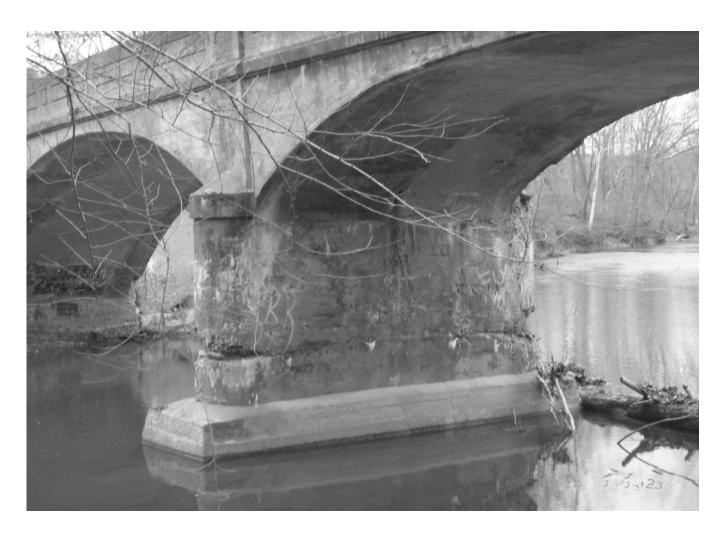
New Hope Bridge Morgan County County Route 8/1 spanning Sleepy Creek Downstream view of pier and nose
